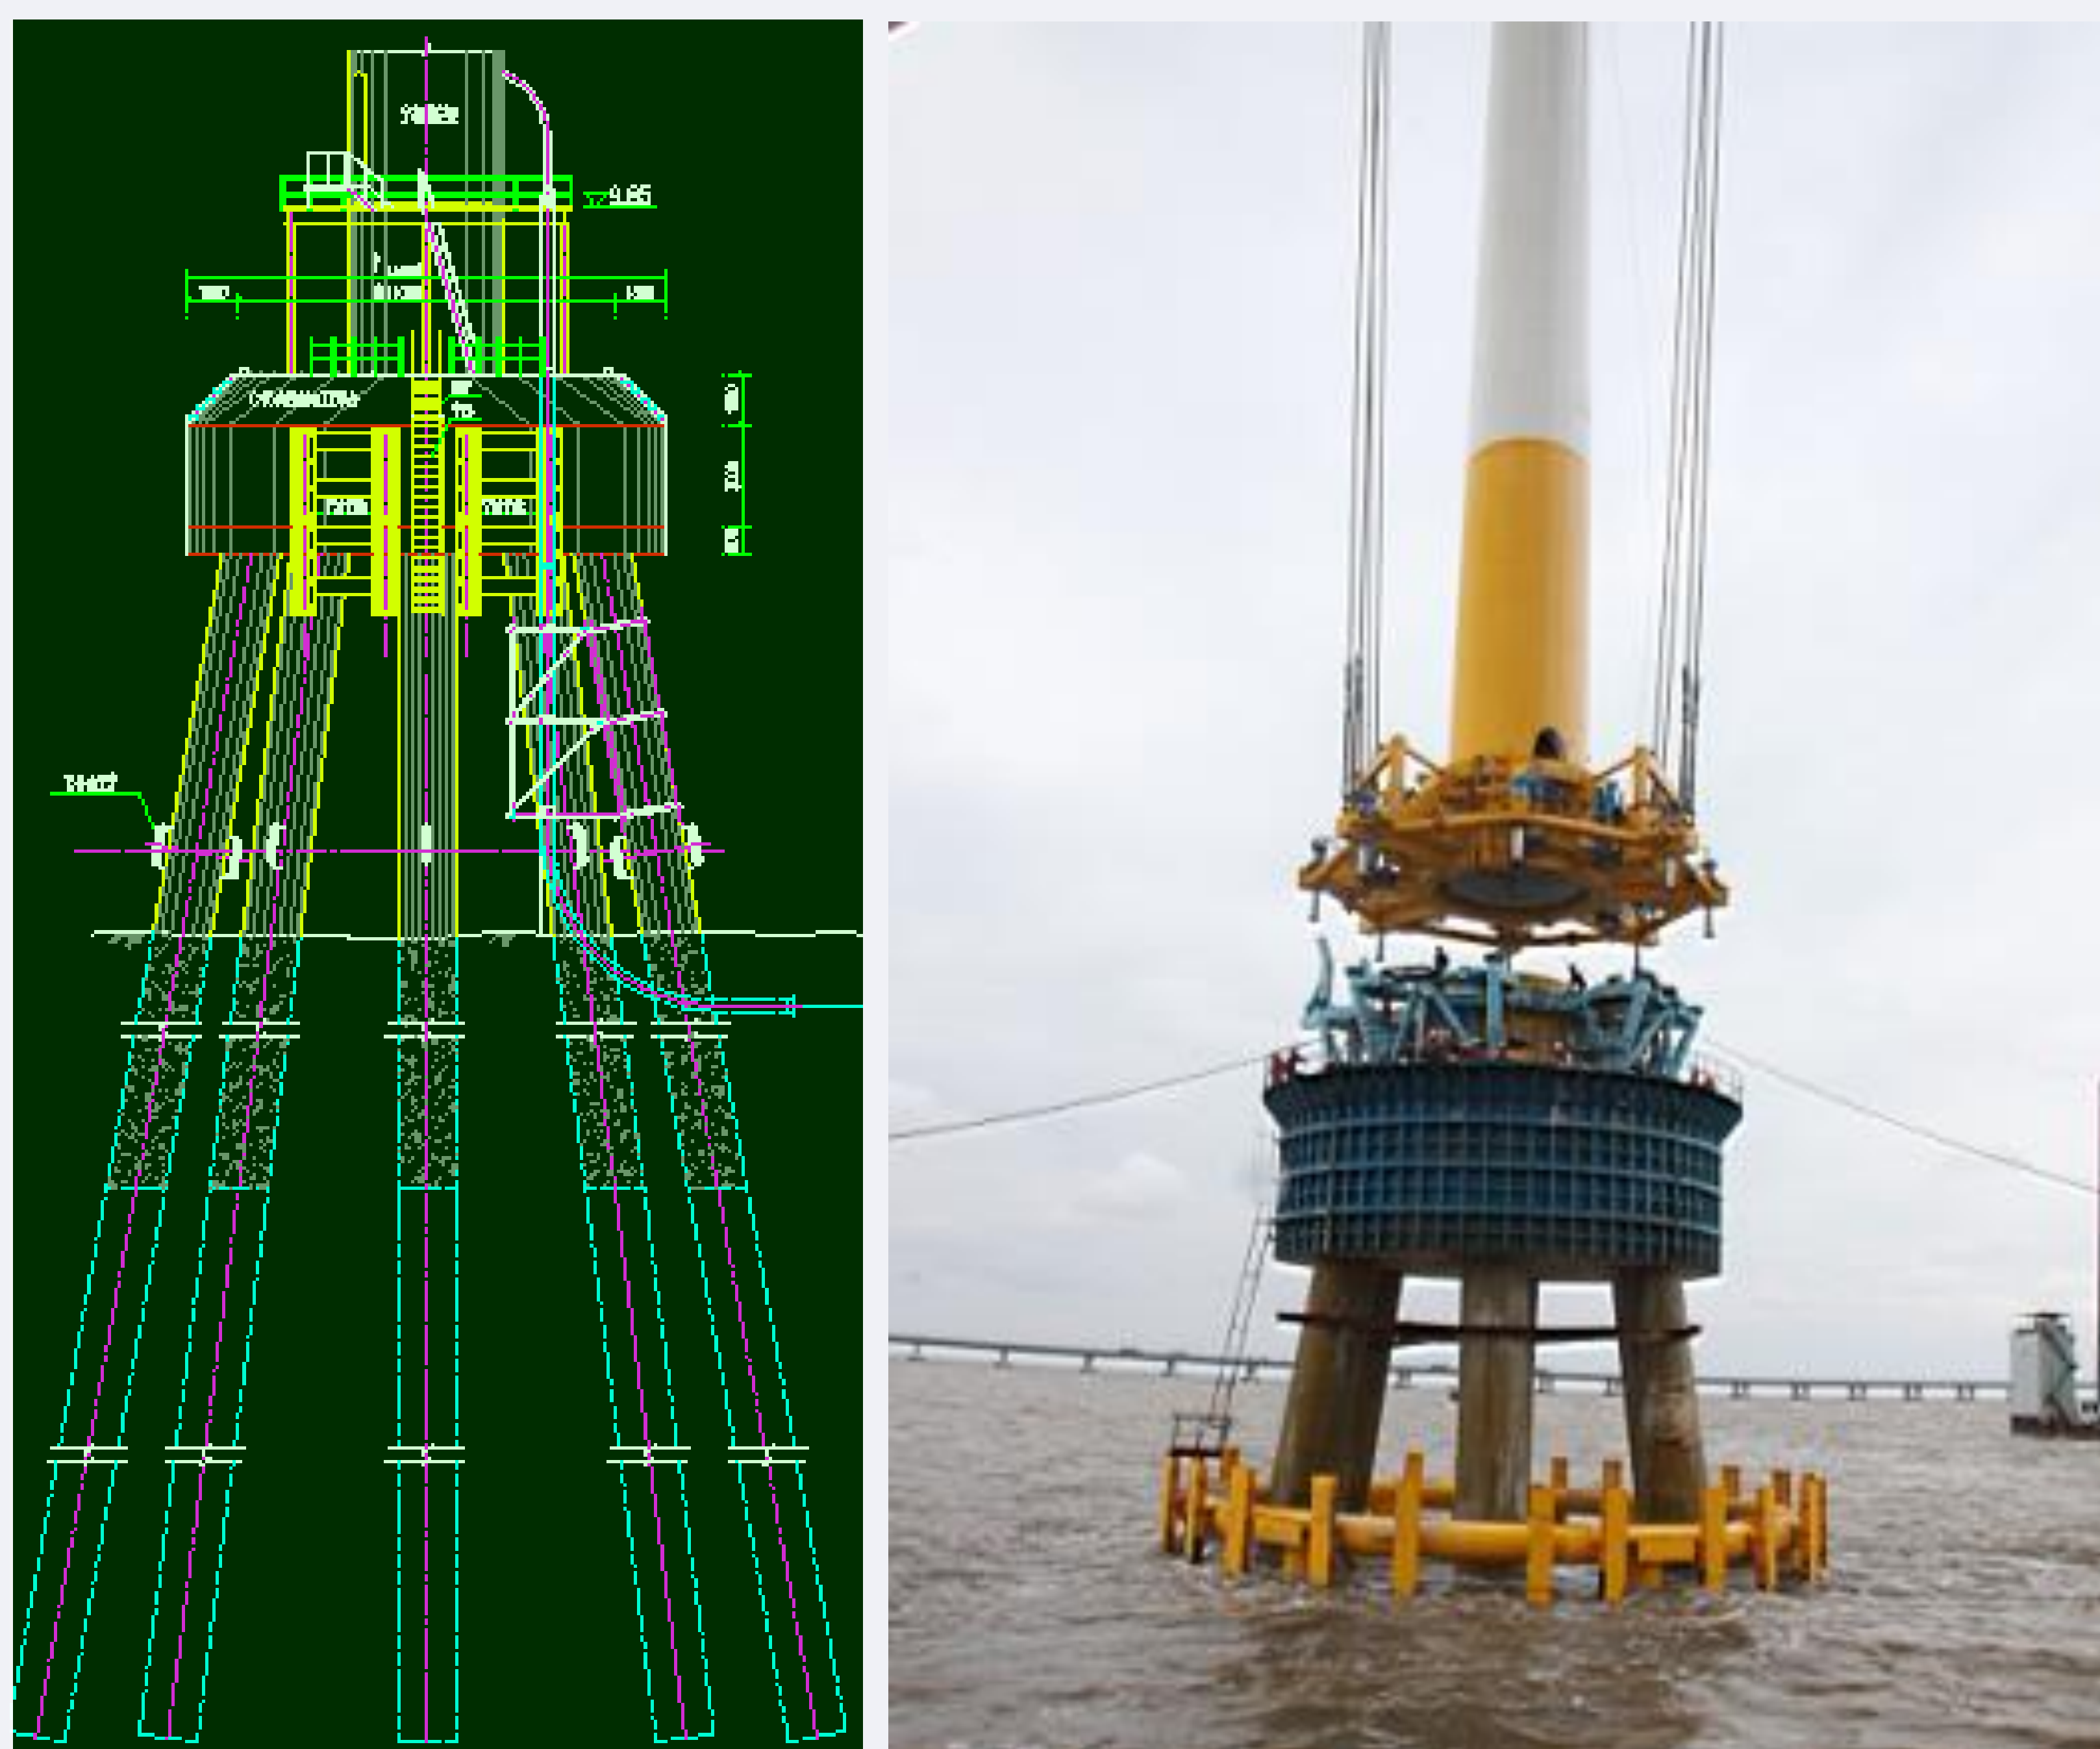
New foundation (courtesy Dr. Yifeng Lin)
